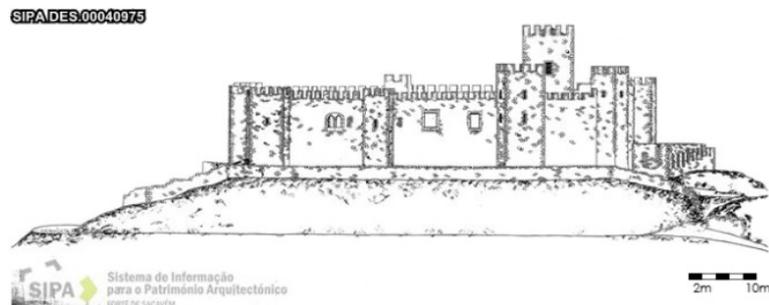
West elevation of the castle (Source: SIPA, n.d.)
